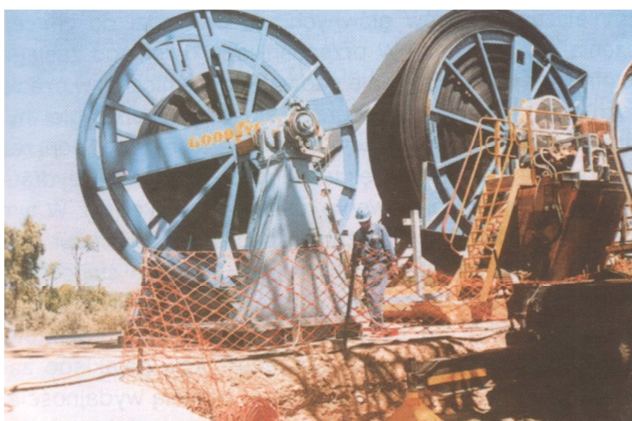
1120 meters belt section in as special cassette (Bulk Solids Handling).
